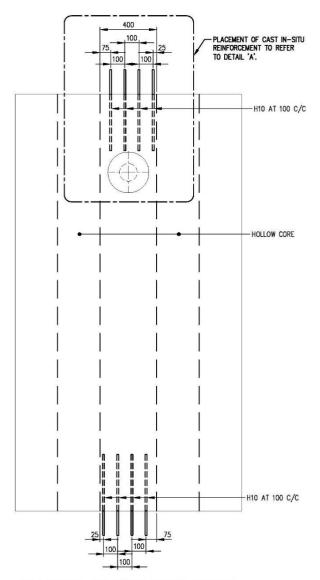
(i) DETAILS OF TRIMMER BARS FOR VENTILATION SLEEVE
